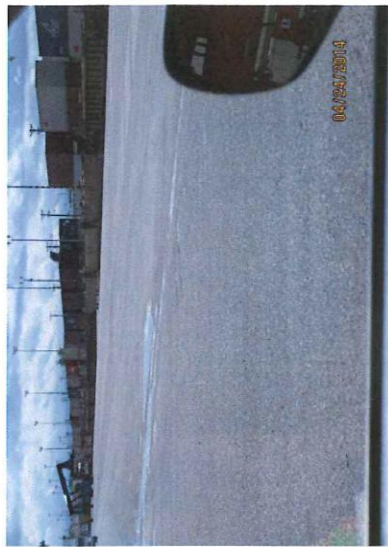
Asphalt Cap and Container Storage, Looking Northwest.
